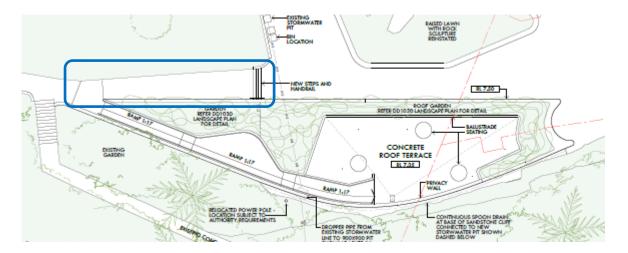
Plan of new amenity building and proposed area of physical commencement.
